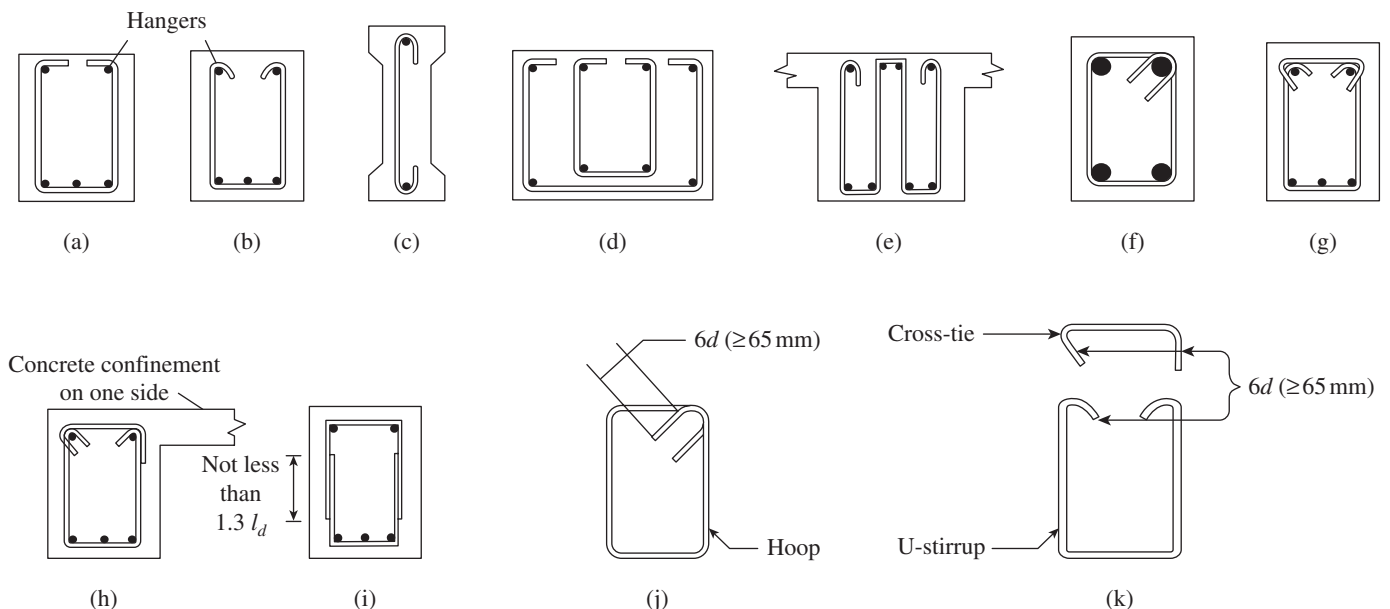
Types of vertical stirrups (a)–(e) Open stirrups for beams with negligible torsion (f)–(i) Closed stirrups with significant torsion (j)–(k) Detail of 135° hook
